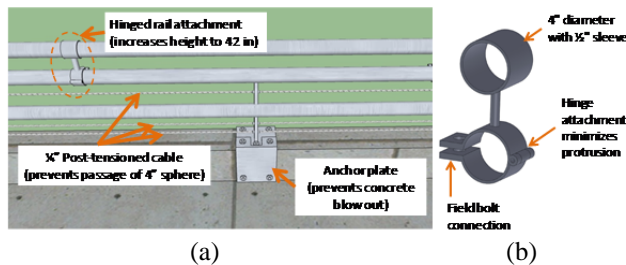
Recommended retrofit design for rail attachment on vehicle barrier: (a) schematic representation with added safety features and (b) hinged rail attachment connection
